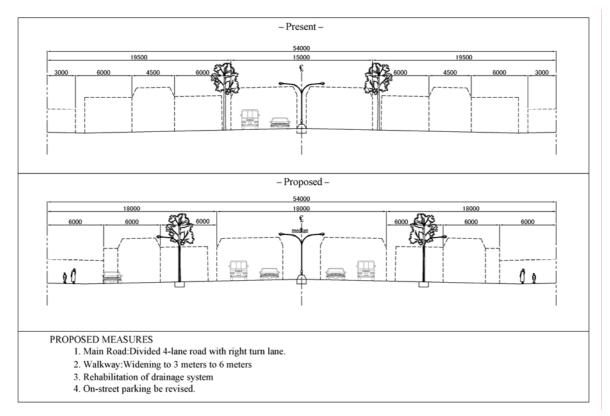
(1) TYPICAL CROSS-SECTION OF MOI AVENUE BETWEEN SLIP ROAD AND KENYATTA AVENUE
